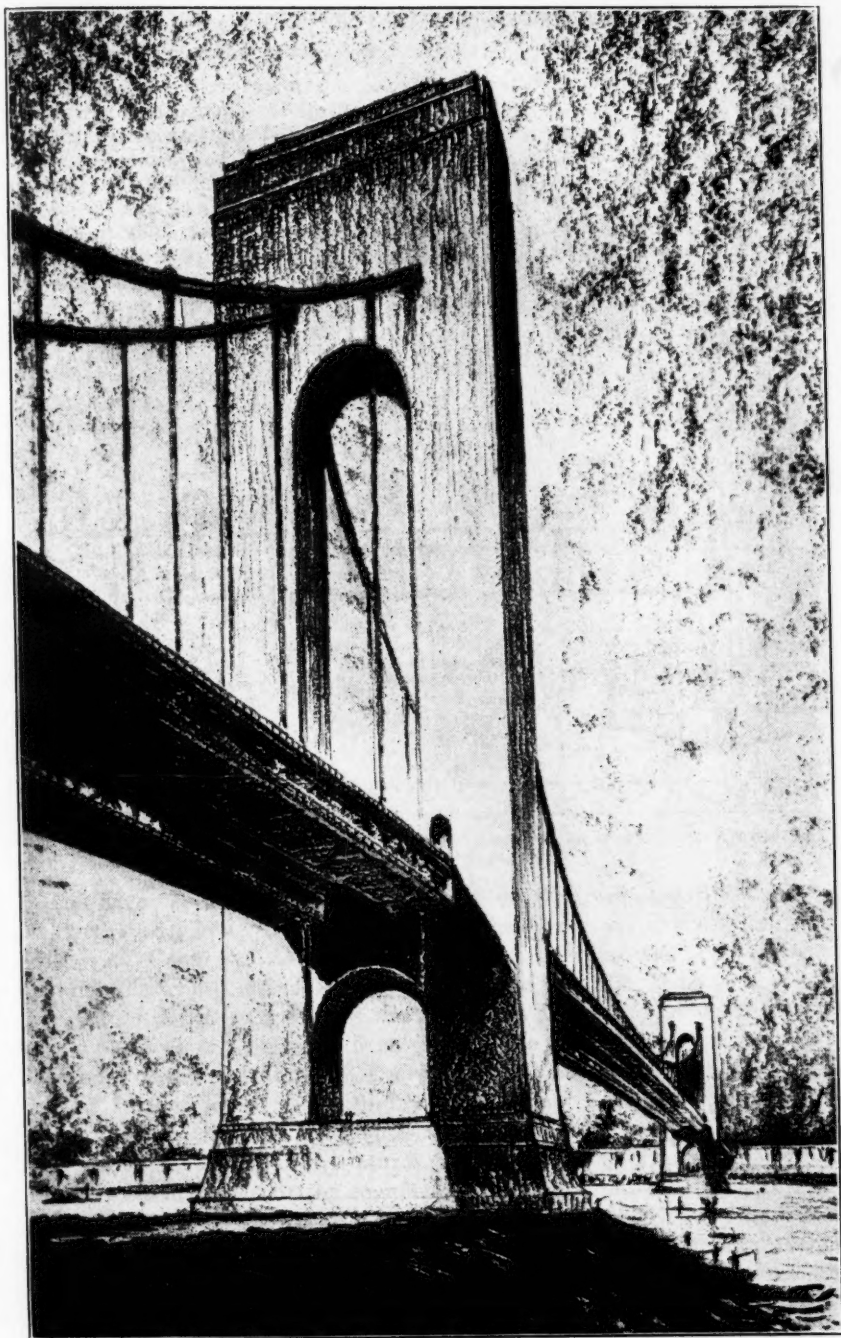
SUSPENSION BRIDGE PROPOSED FOR 179TH STREET, MANHATTAN, IN DECEMBER, 1923.
